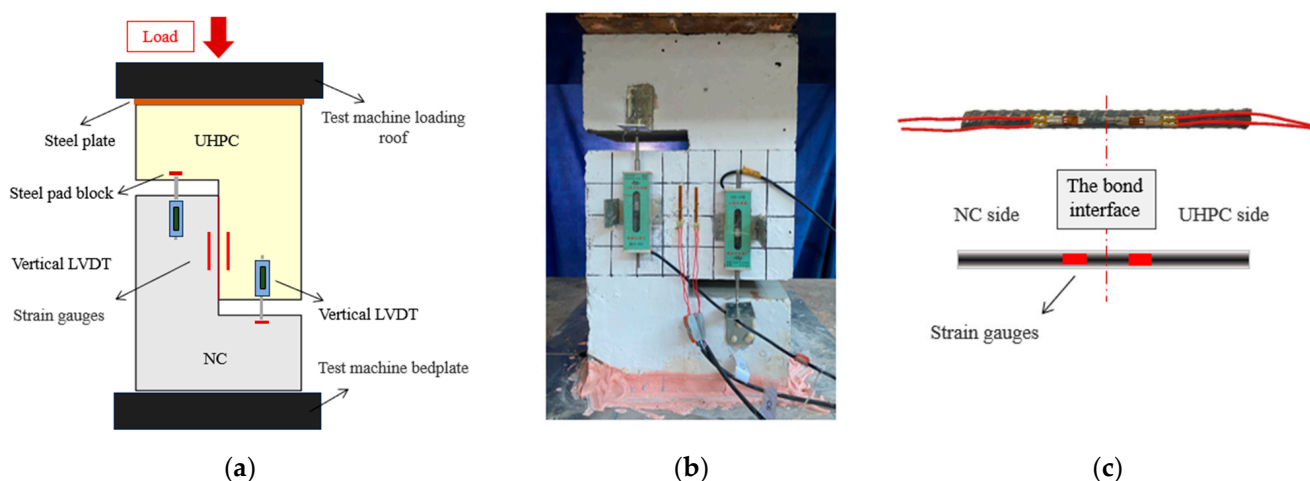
Test device and instrumentation arrangement: (a) test device and specimen arrangement; (b) the specimen layout; (c) strain detection of shear steel rebars.
